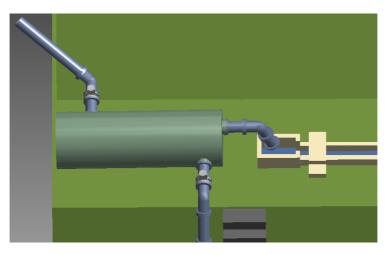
3D CAD drawing of forebay tank and its flange connections.
